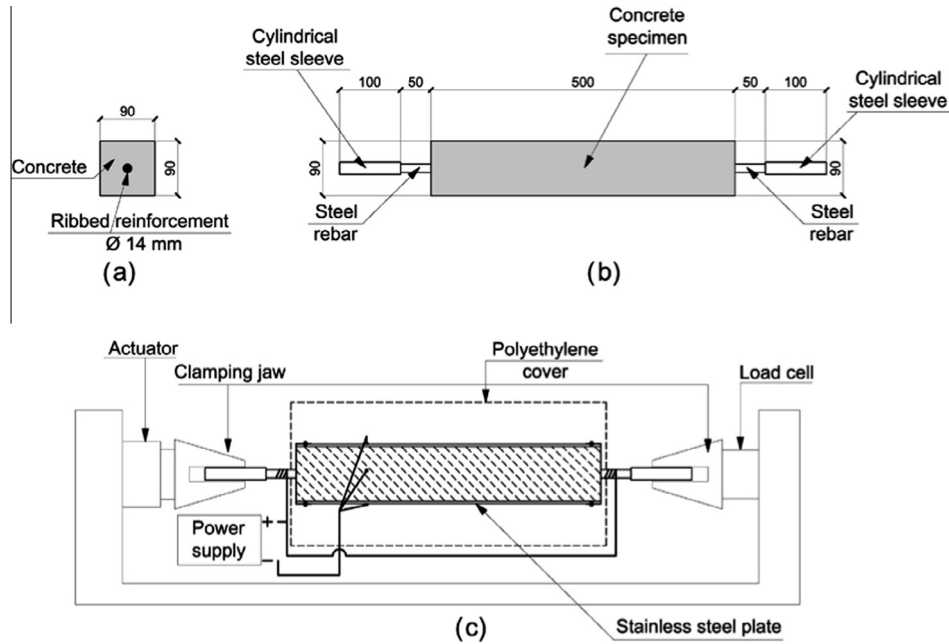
(a) and (b) Specimen dimensions and (c) test set-up.
